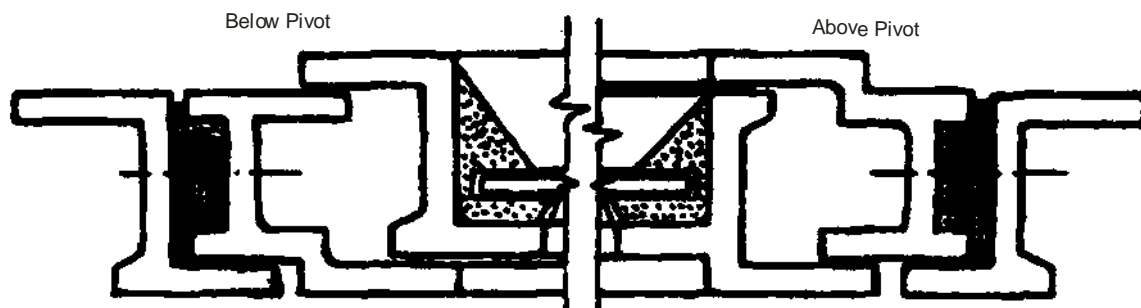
Detail of Horizontal Centre-Hung Ventilator
